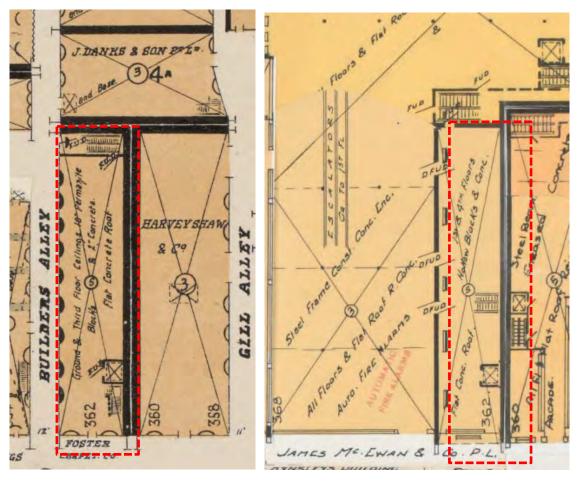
Detail of Mahlstedt fire insurance plan, Map 14, 1925 showing the newly altered warehouse (left); and Mahlstedt fire insurance plan, Map 14, 1948 showing the warehouse forming part of James McEwan and Co's stores (right)
